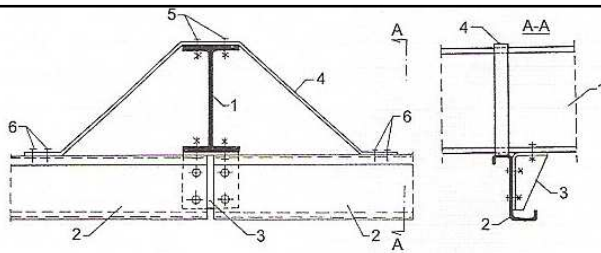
Secondary column protected against lateral buckling: 1- column, 2- wall girt, 3- ribbed angle, 4- band bar, 5- shoot-in nails
